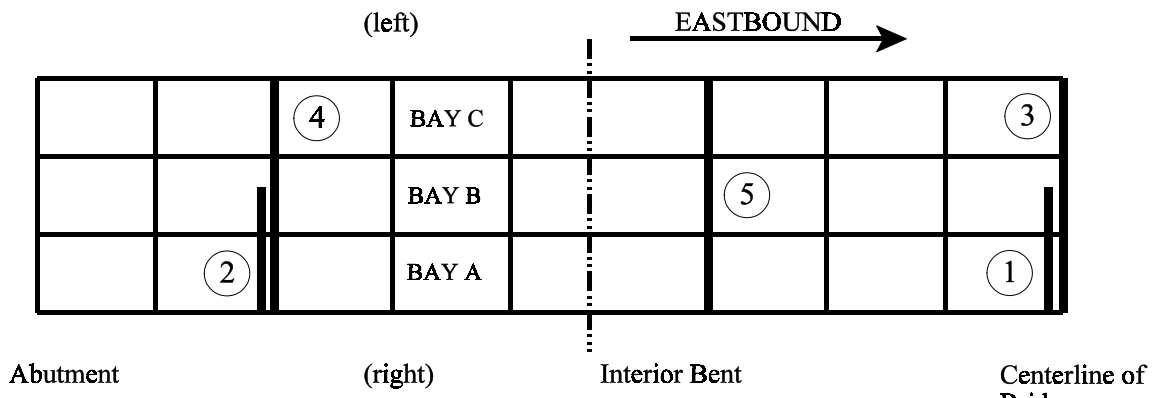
Gage group locations for Coletto Creek Bridge.
